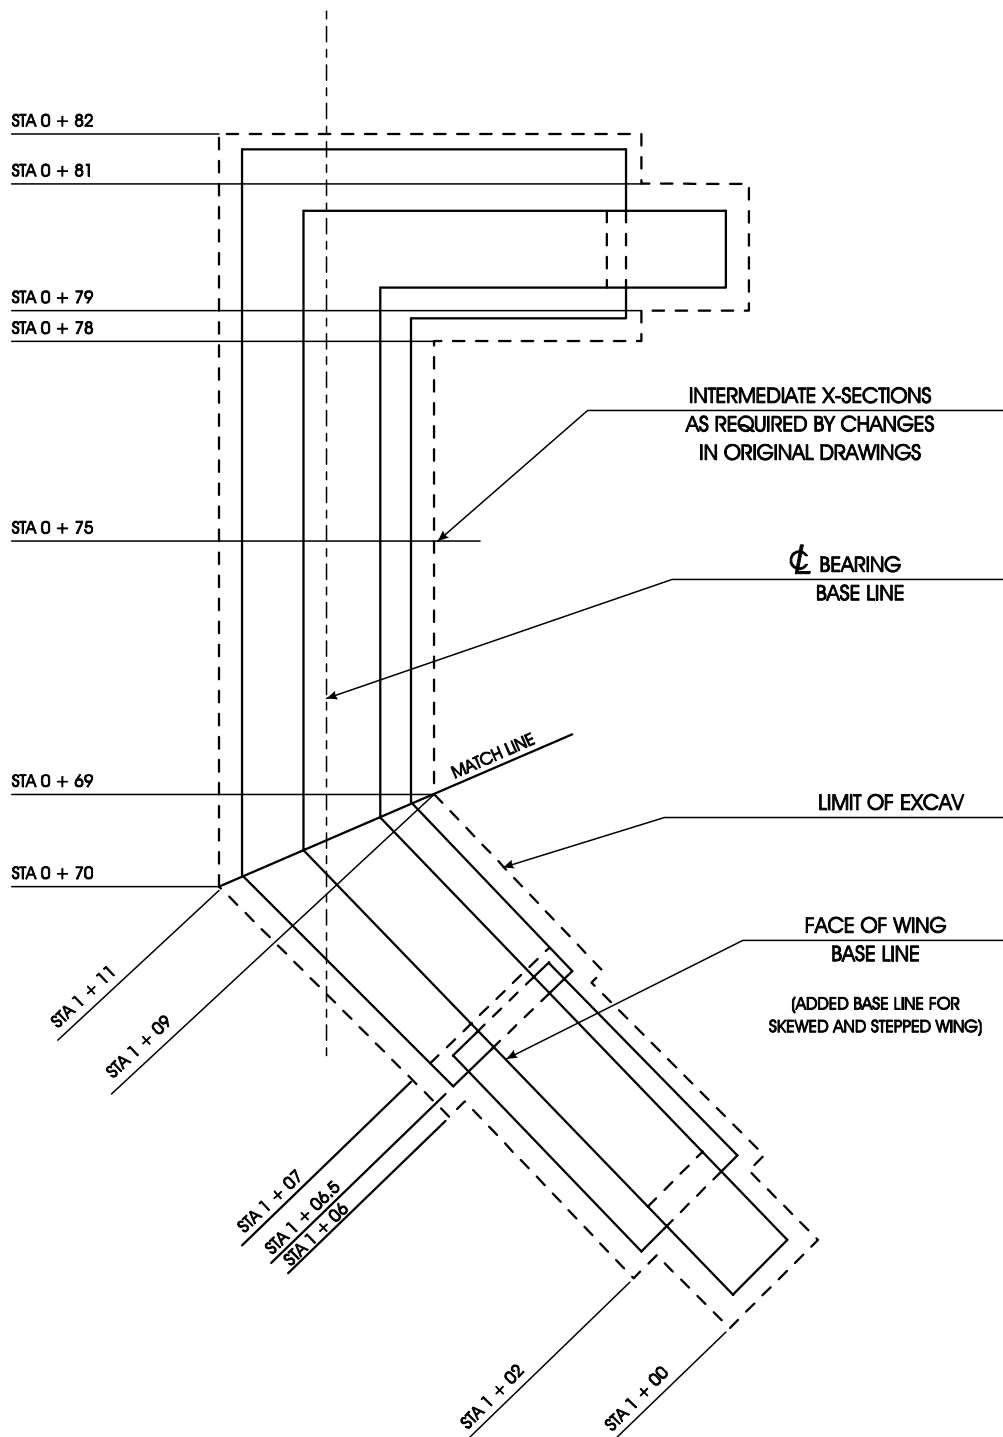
Bridge Excavation Survey Using an Additional Baseline
